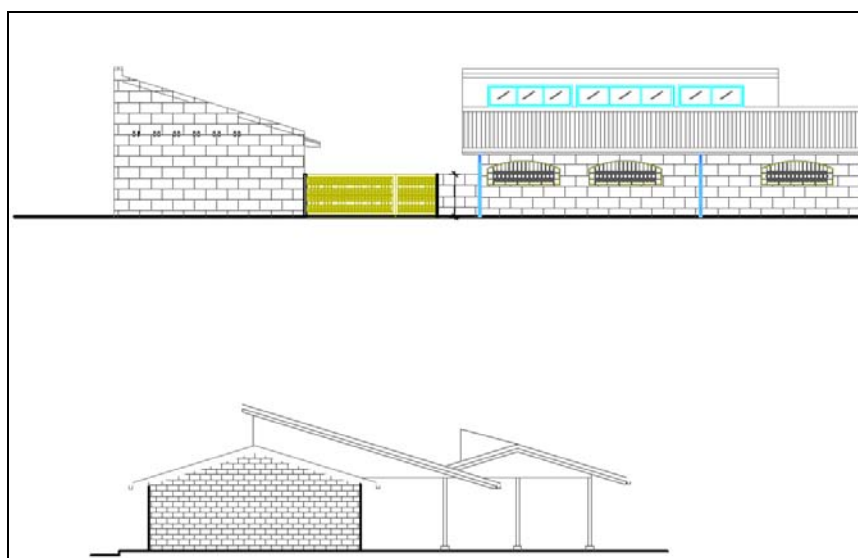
Part of street facade and side facade of the market and sanitary facility in Kratovo
